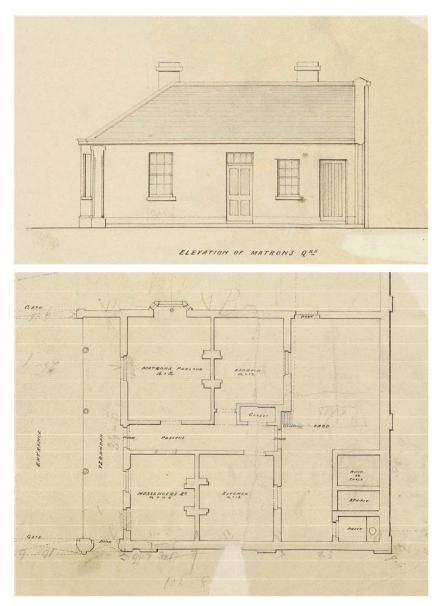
Extract from previous plan of elevation and floor plan for The Matron's Quarters in Yard 4 dated  $12^{th}$  July 1849. Source: Tasmanian Archive and Heritage Office, PWD 2661398
